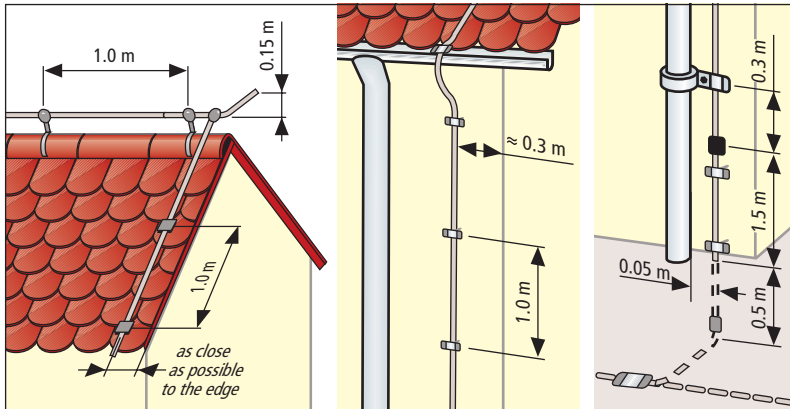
Detail examples of an external lightning protection system at a building with a sloped tiled roof
